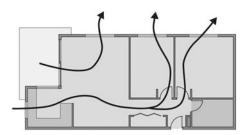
effective layout for an upper level corner dwelling/apartment.
